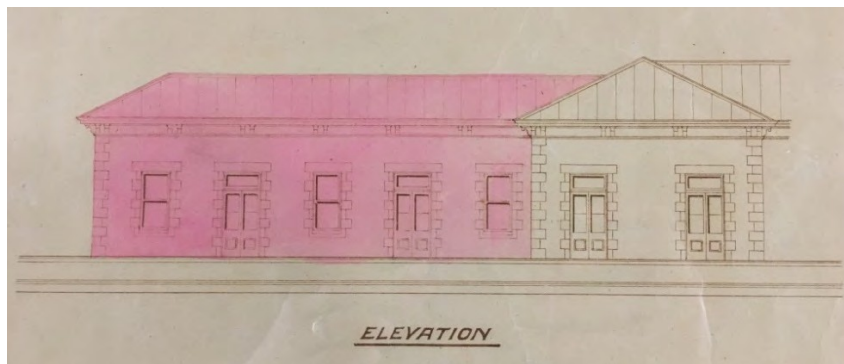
Elevations of new refreshment room – new additions are shown in pink. Drawing dated 20.2.1912. Source: QSA Series 17692 Plans of Queensland Railway Station Buildings etc., Item ID 120966
